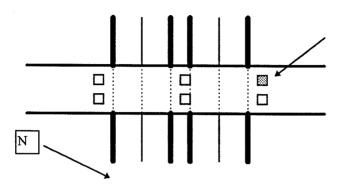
Sketch of bridge 20-0085 from above. The investigated column is marked.
